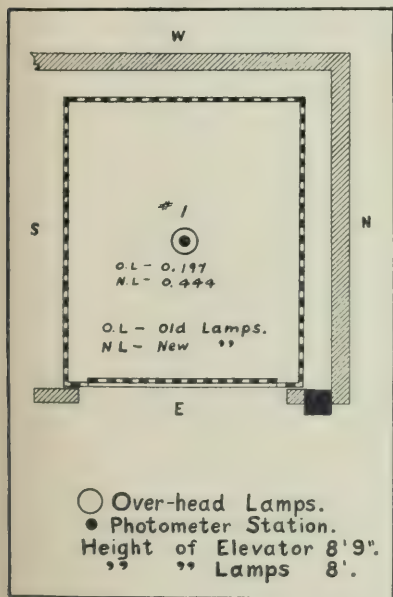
Section plan showing elevator No. 41 with location of lighting units, test stations and illumination data.
